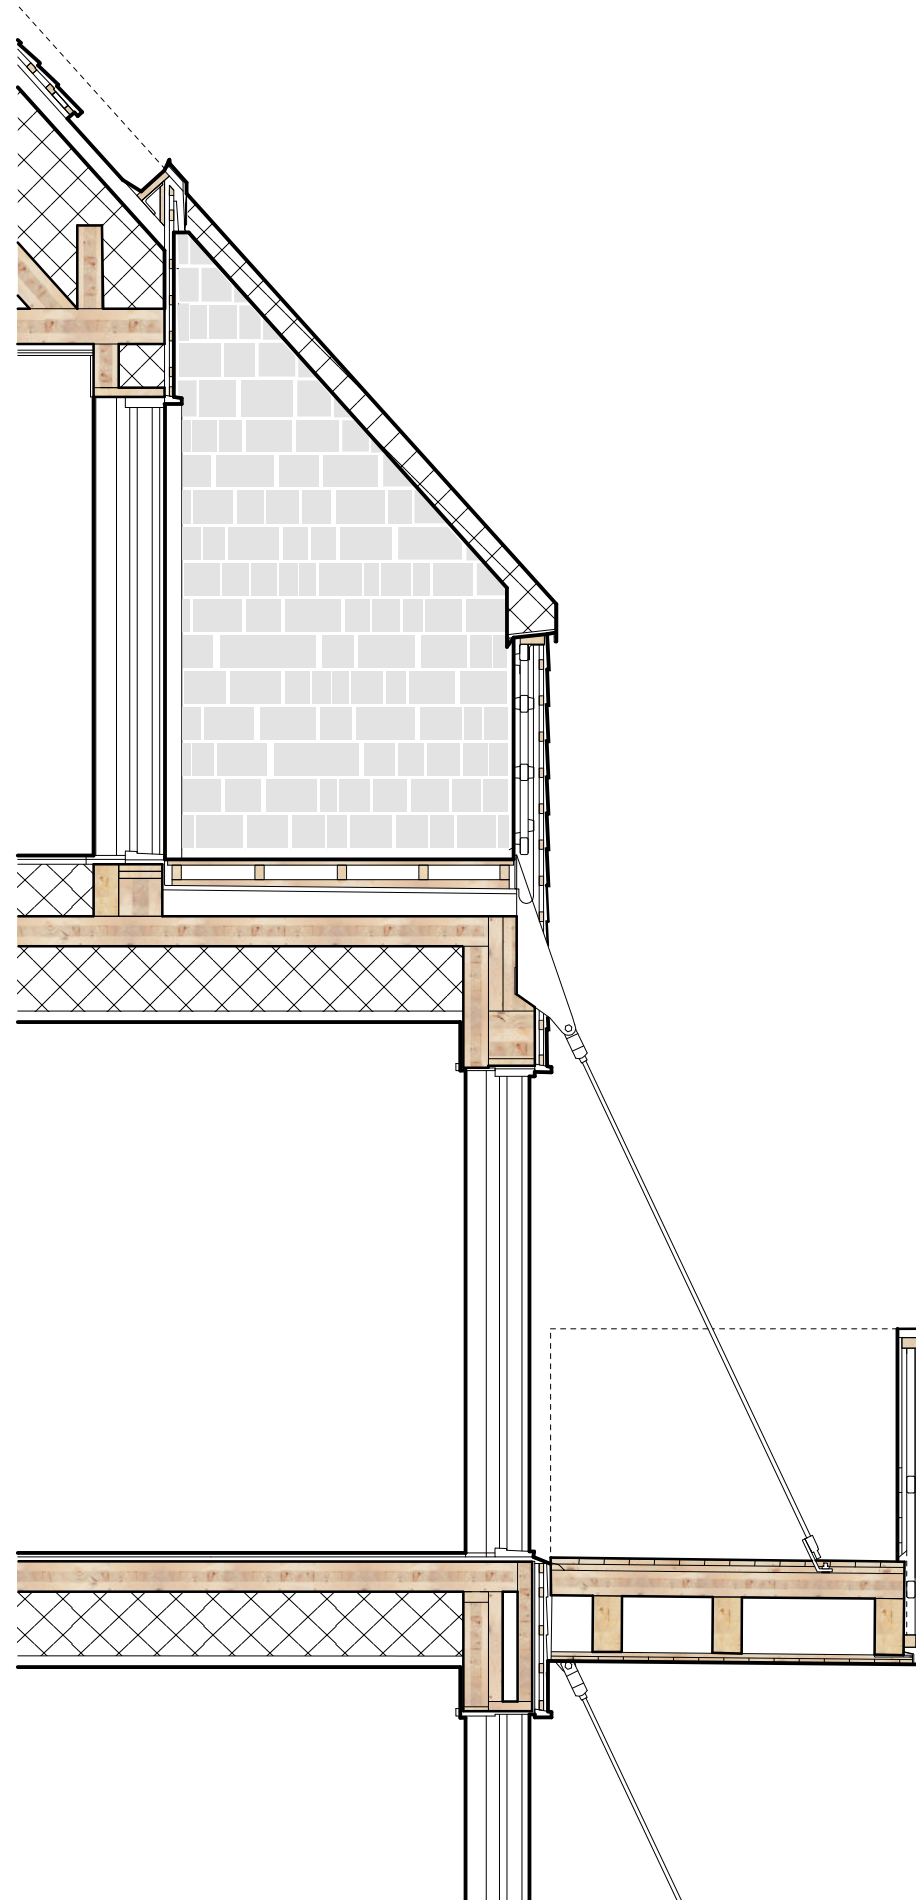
Vertical section for building with high demands regarding sound insulation. Joint to exterior wall.
